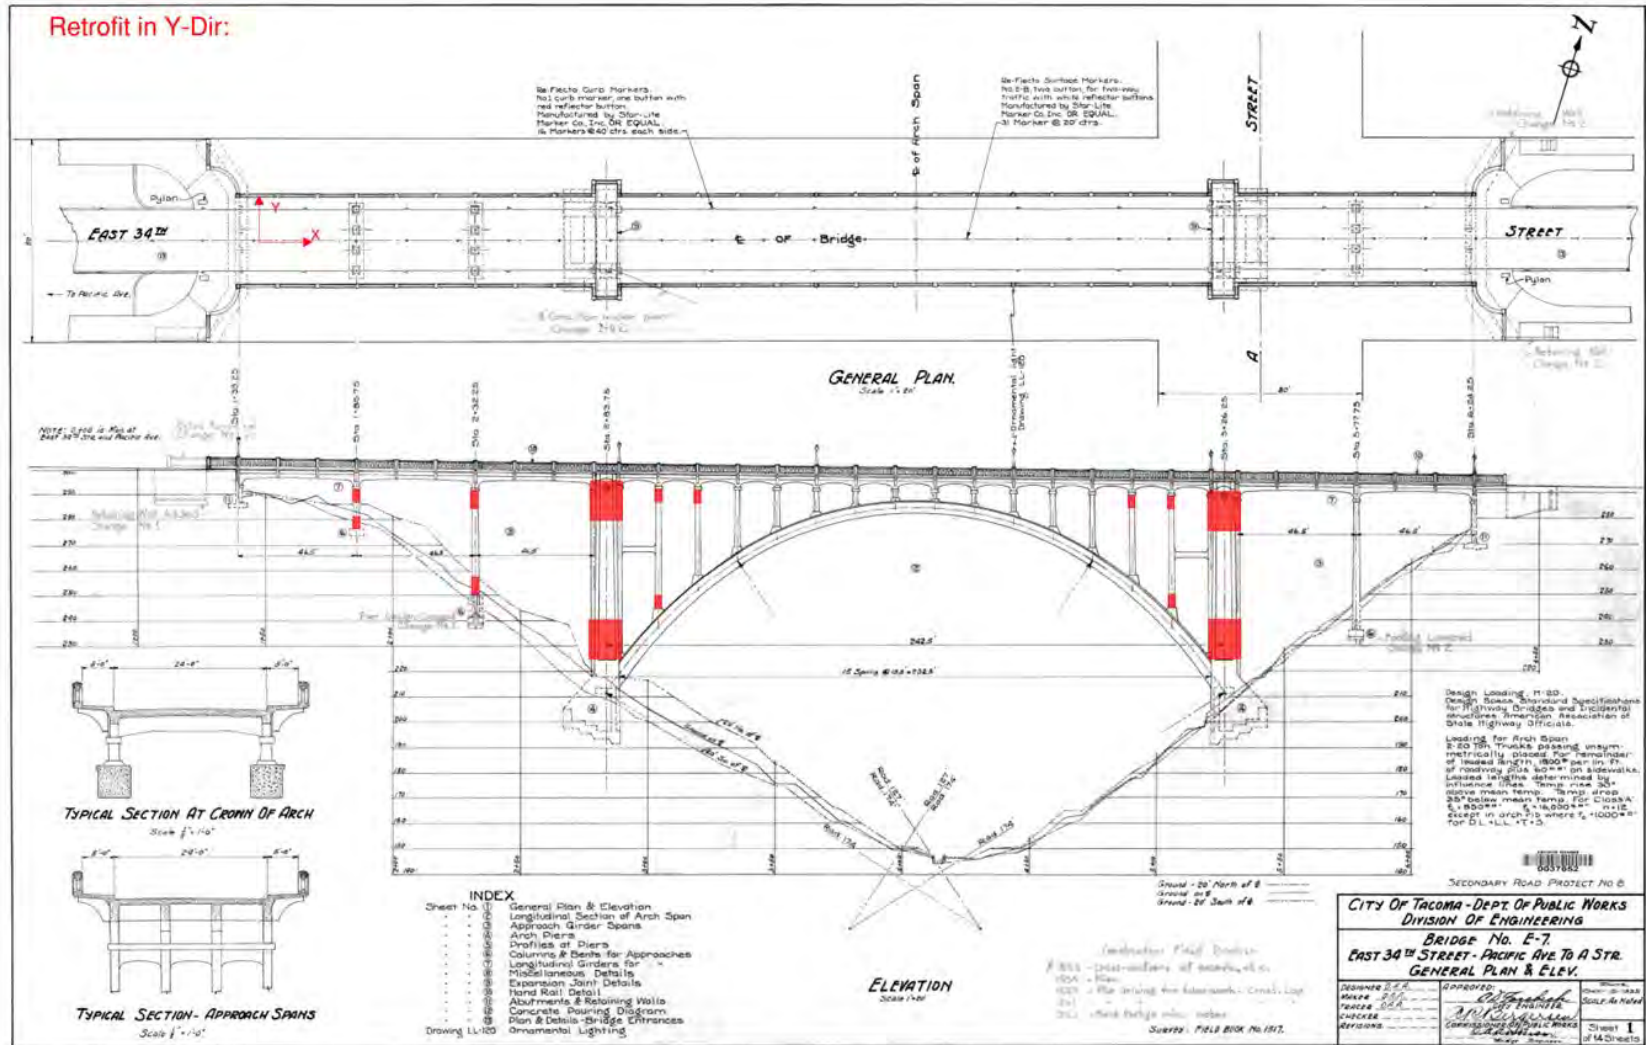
Retrofit locations for Seismic at the Transverse direction for E 34th St Bridge deck repair and seismic retrofit (as provided by Exeltech).
